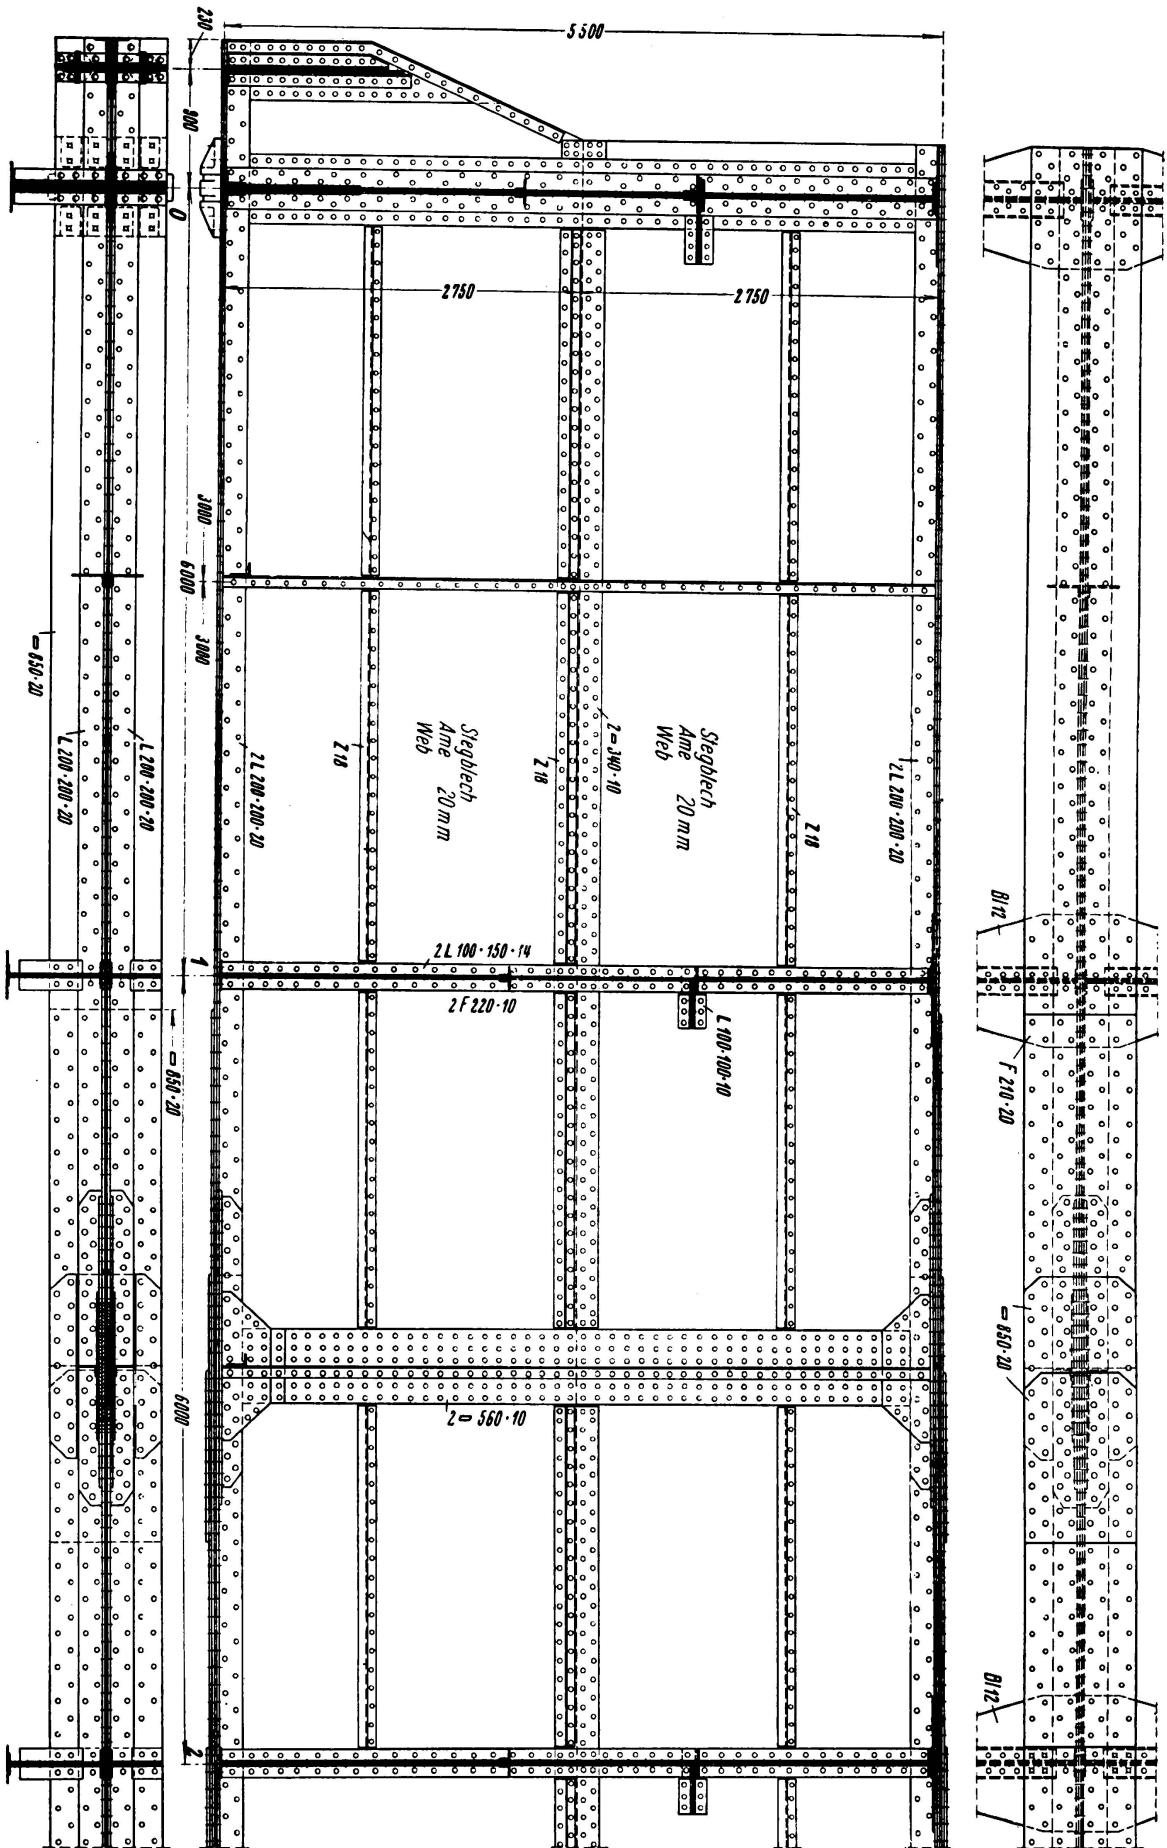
Main girder between cross beams 0 and 2. Interior view.
